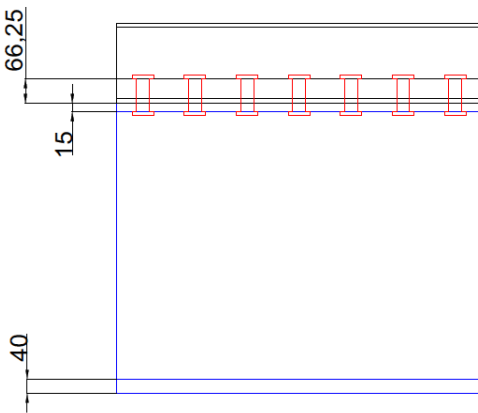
Side View of Connection Design. Note that the Top Flange of the Steel Profile has been Drawn out of Scale to Improve Visibility.
